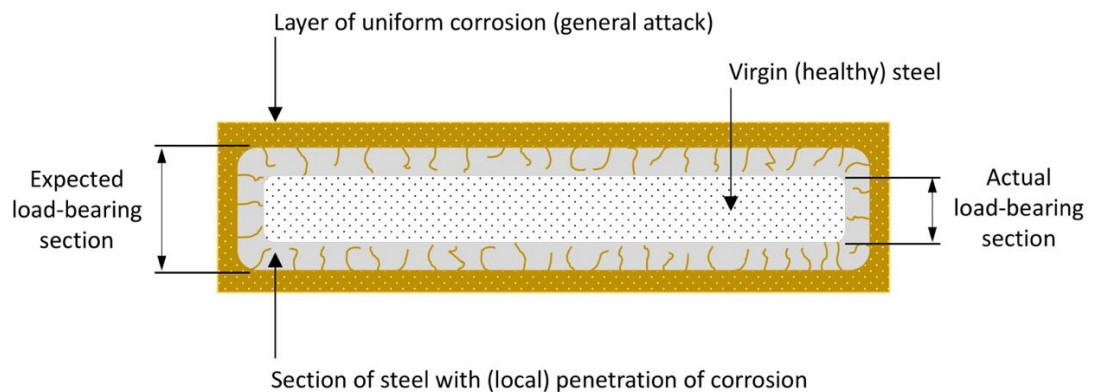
4 : Cross-sectional view of a corroded member illustrating the penetration of corrosion
